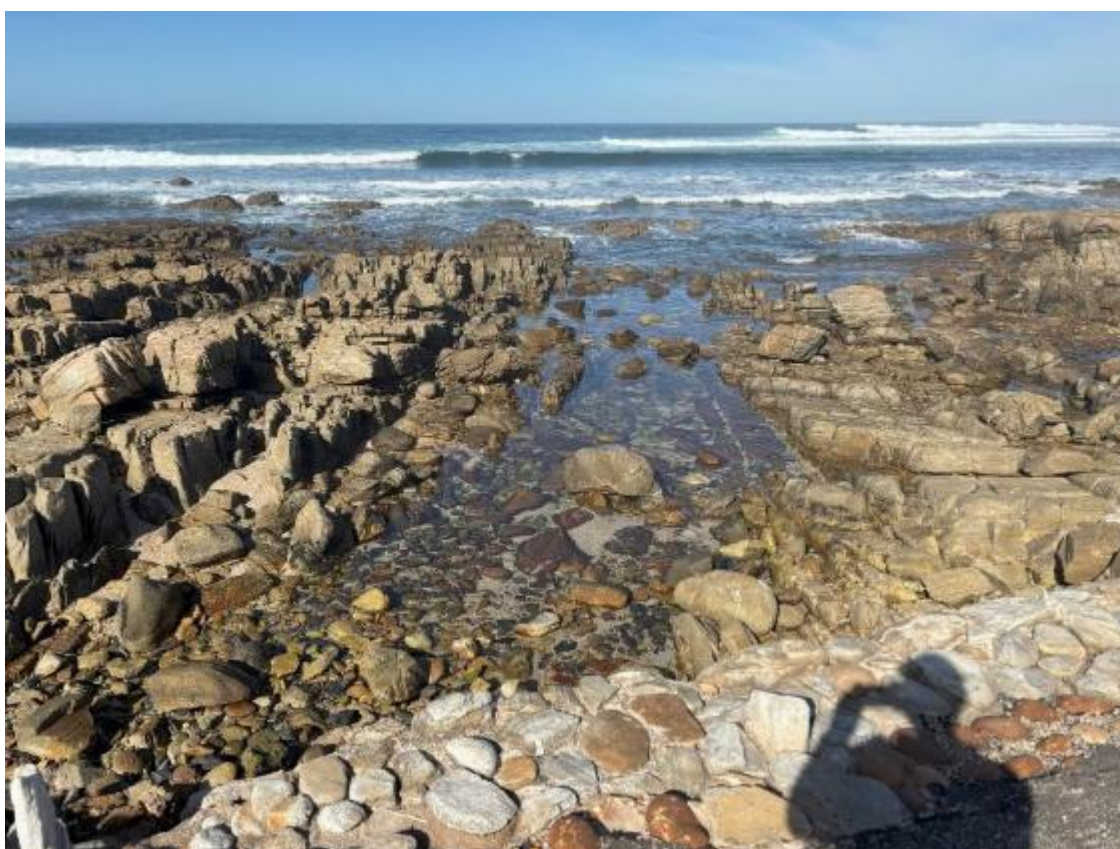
Between Ch450 and Ch500 no verge with retaining wall next to roadway
